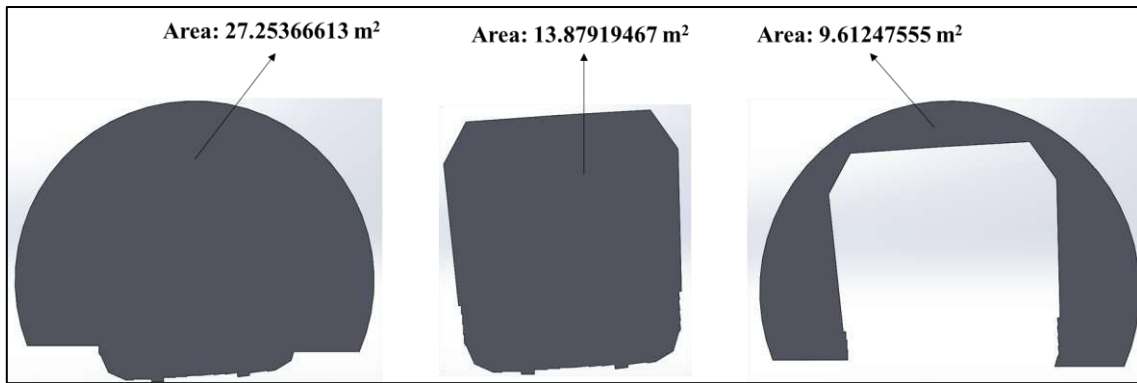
Tunnel and Train’s Cross-sectional Areas
